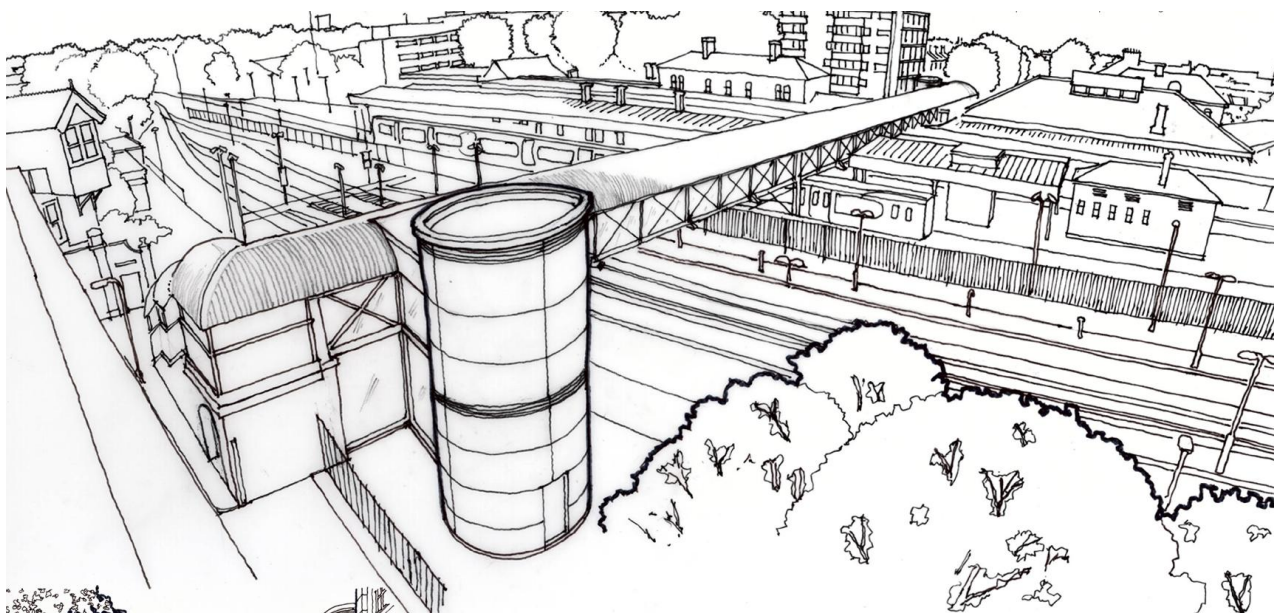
An initial proposal for making Hove Station Footbridge more accessible
